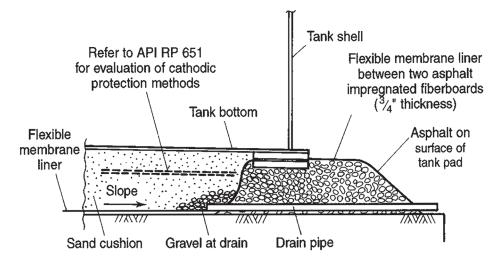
Earthen foundation with undertank leak detection at the tank perimeter (from API, 2005)
